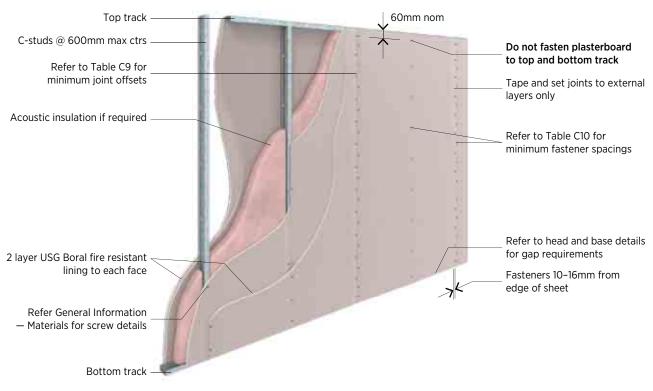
Fire Rated Steel Stud - Vertical Fixing - Multiple Layer
